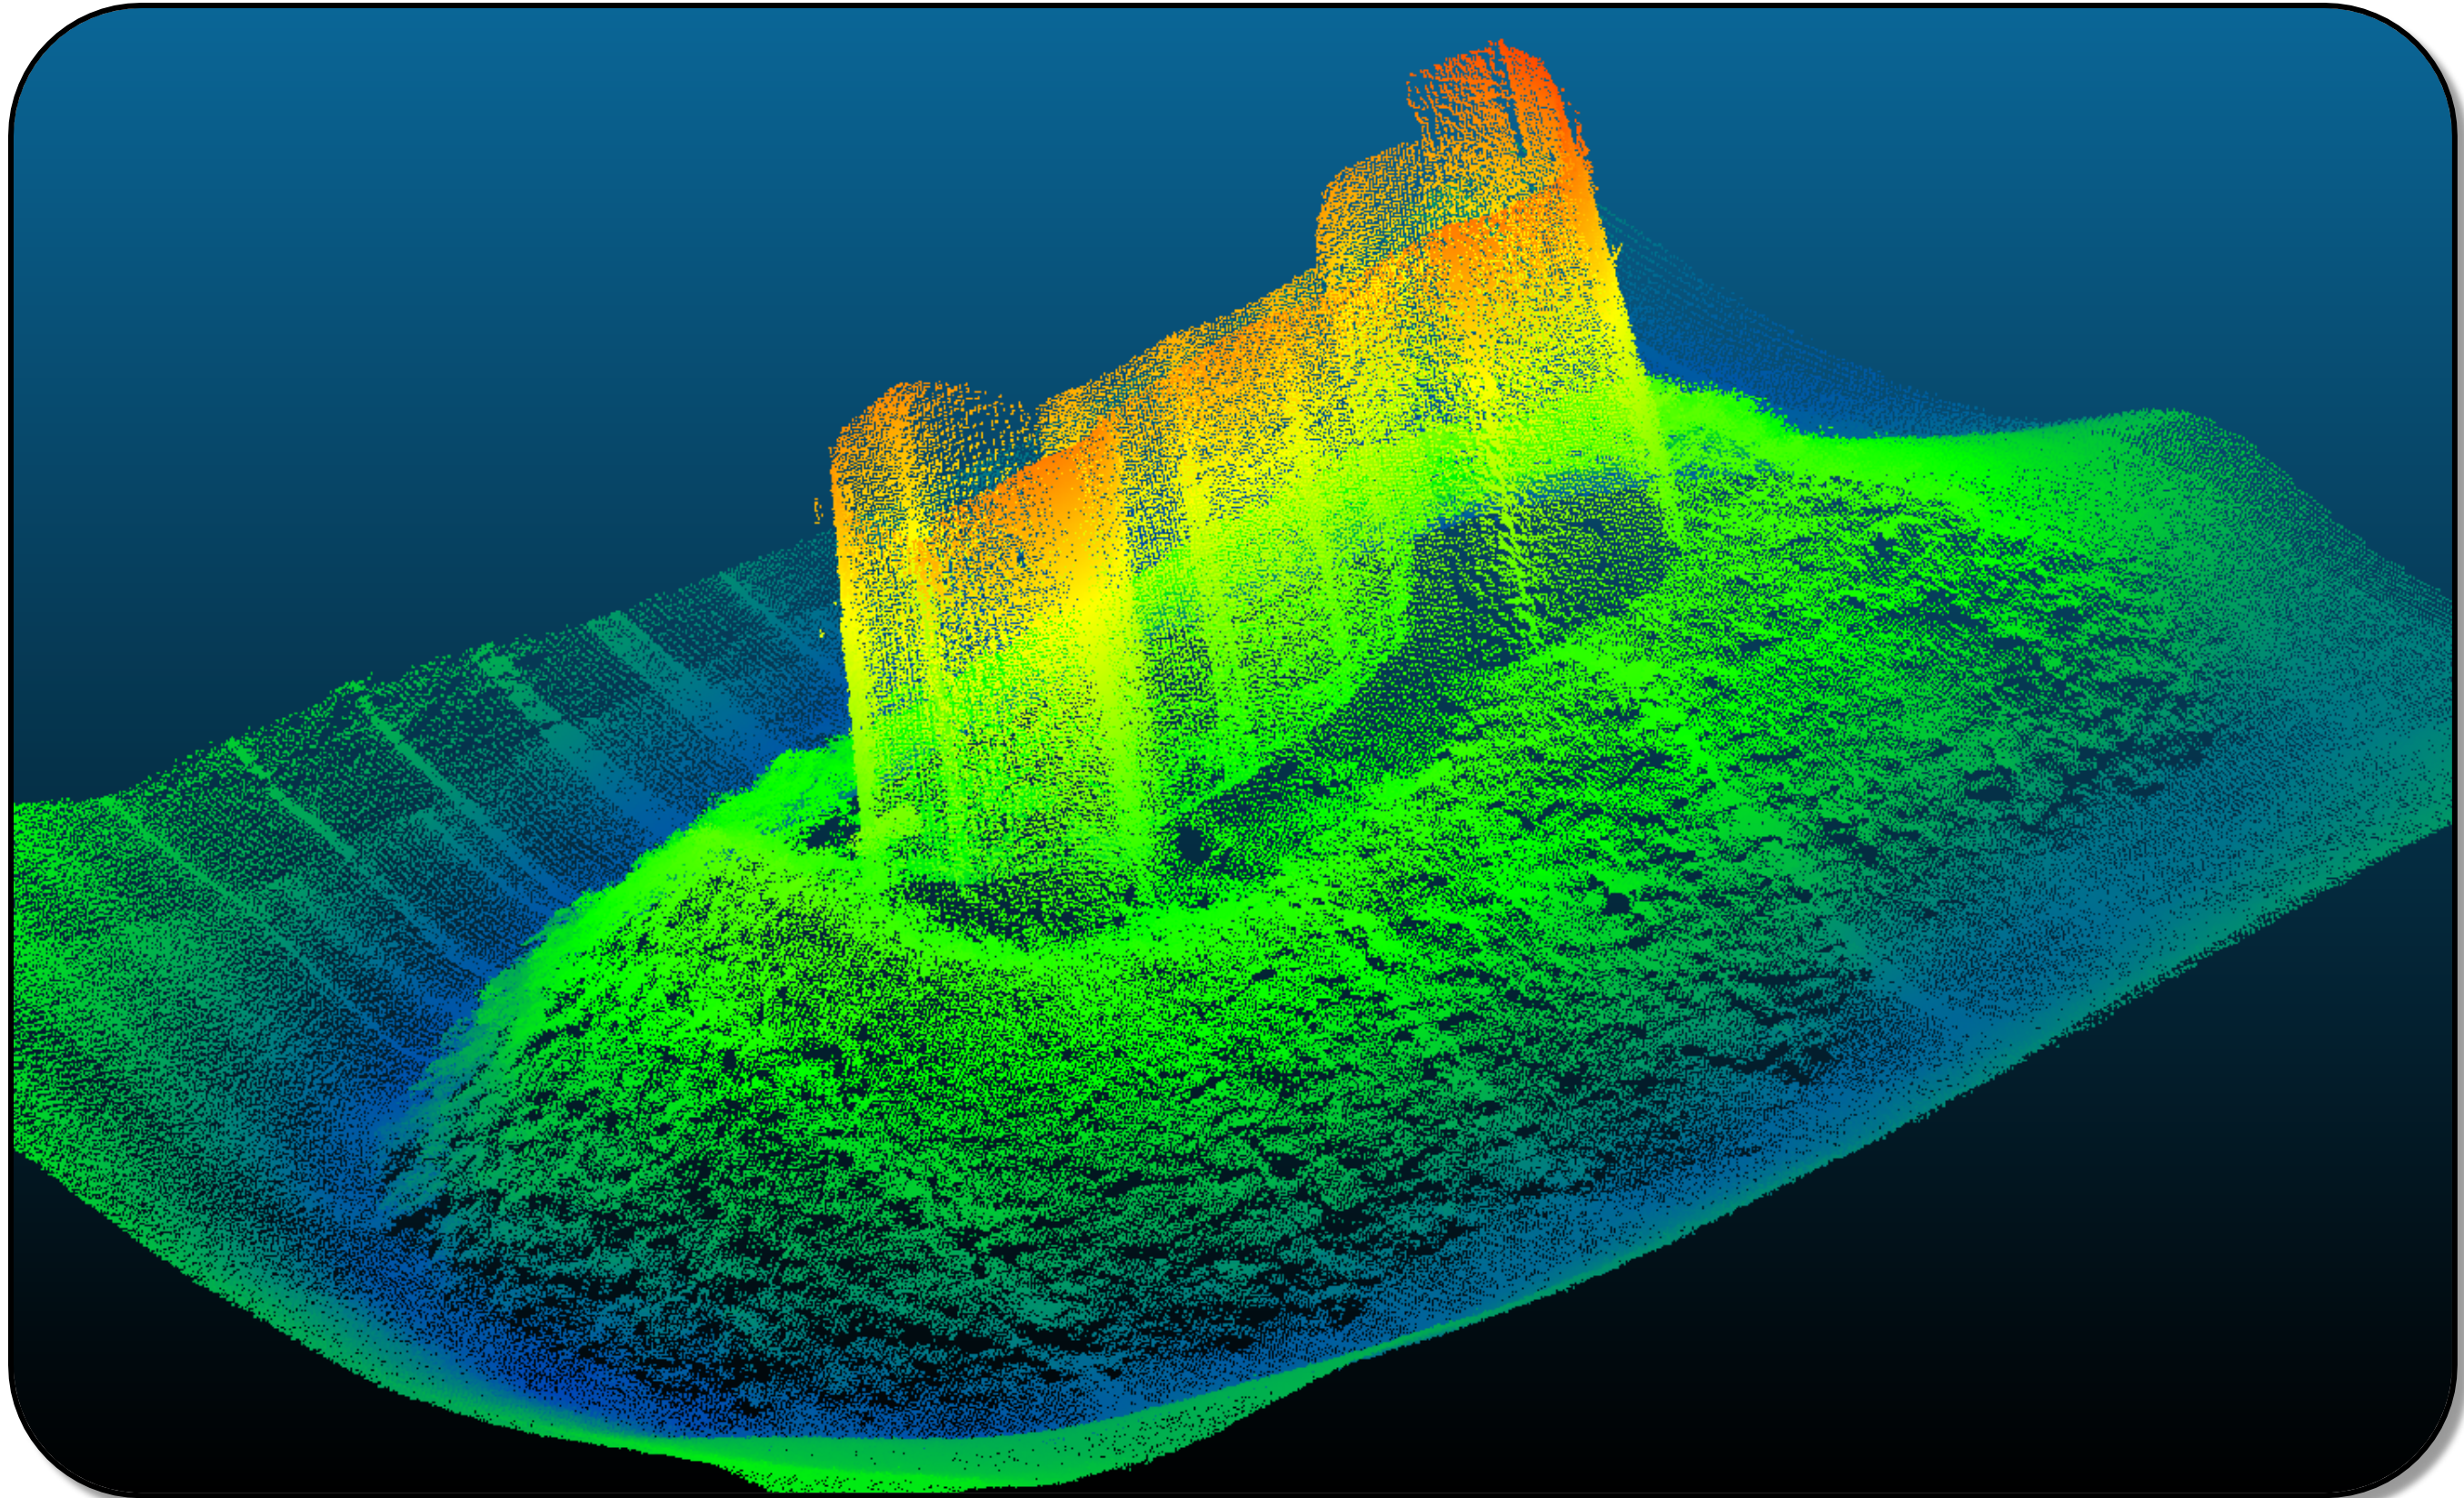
Perspective view of Pier 11 point cloud (looking from the northeast direction).
